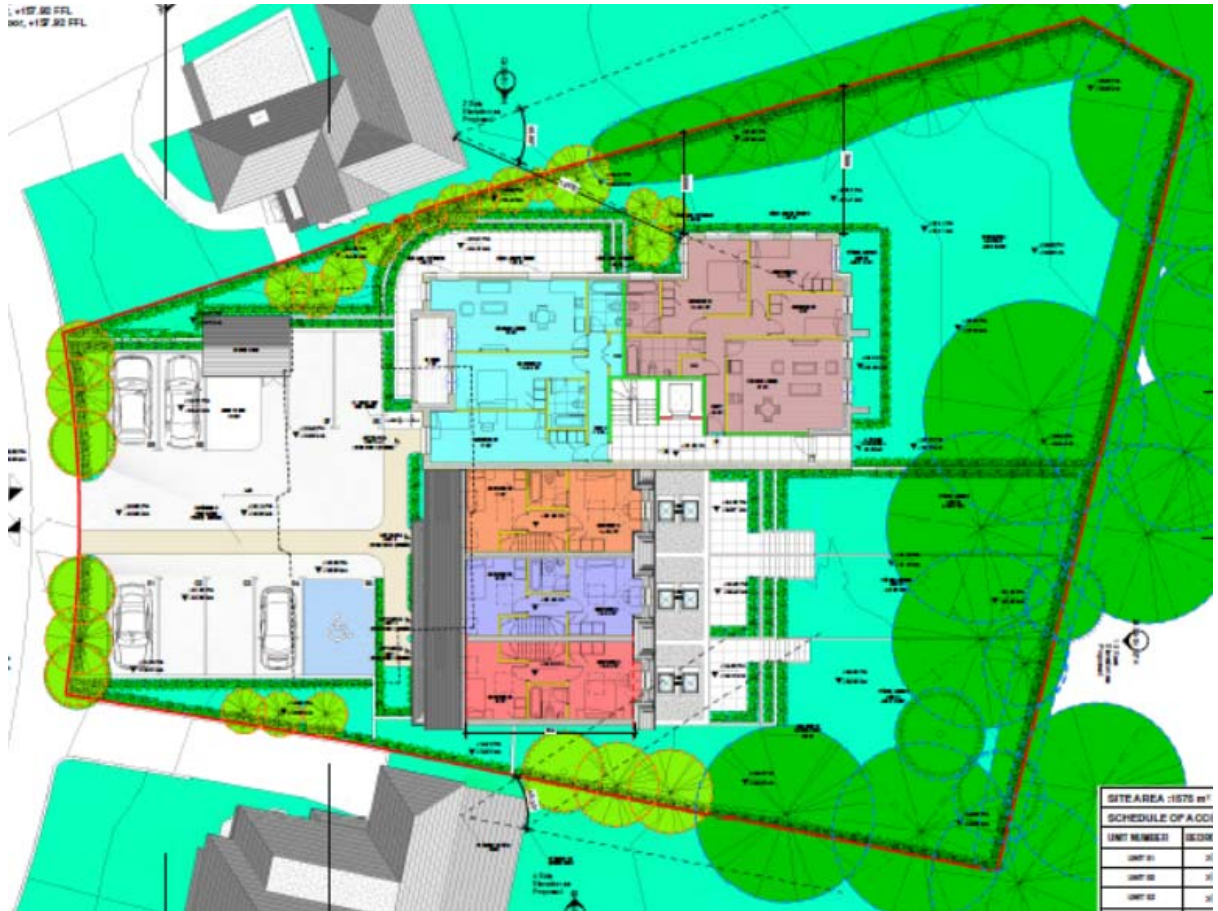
Proposed first floor site plan showing proposal in relation to neighbouring properties
